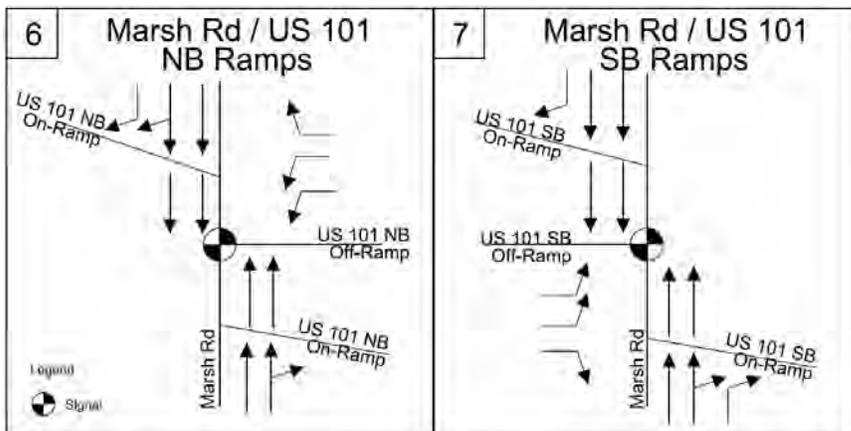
Ravenswood Ponds Existing Lane Geometries
